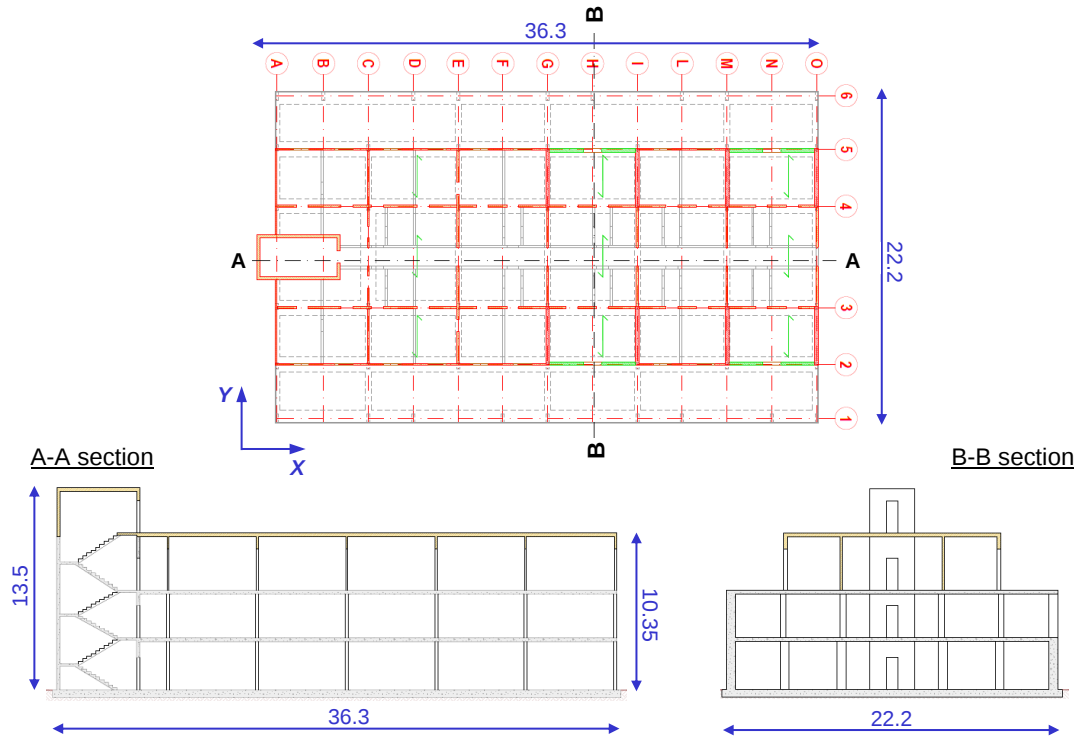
Top storey structural plan, and longitudinal and transversal cross sections including the LFT top addition (dimensions in meters)
